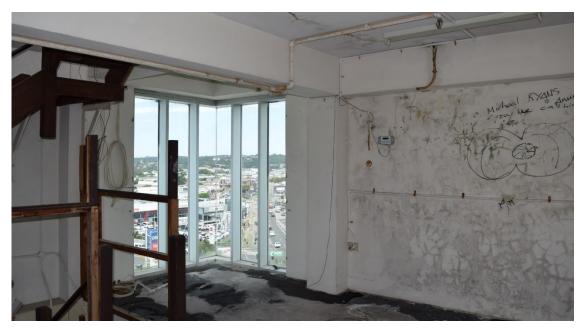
Looking towards the top-floor window within the clocktower. Note: Interior graffiti to the internal walls and rising/falling damp.
